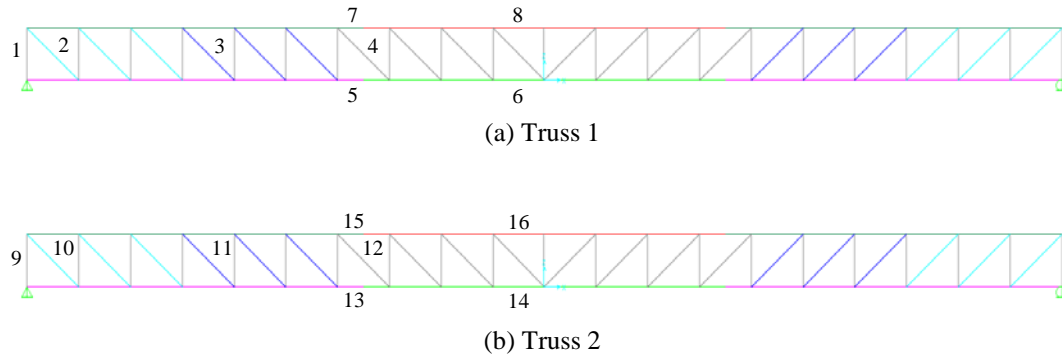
Location and Designation of Truss Members Designed for (a) Truss 1 using Conventional Construction and (b) Truss 2 using Accelerated Construction
